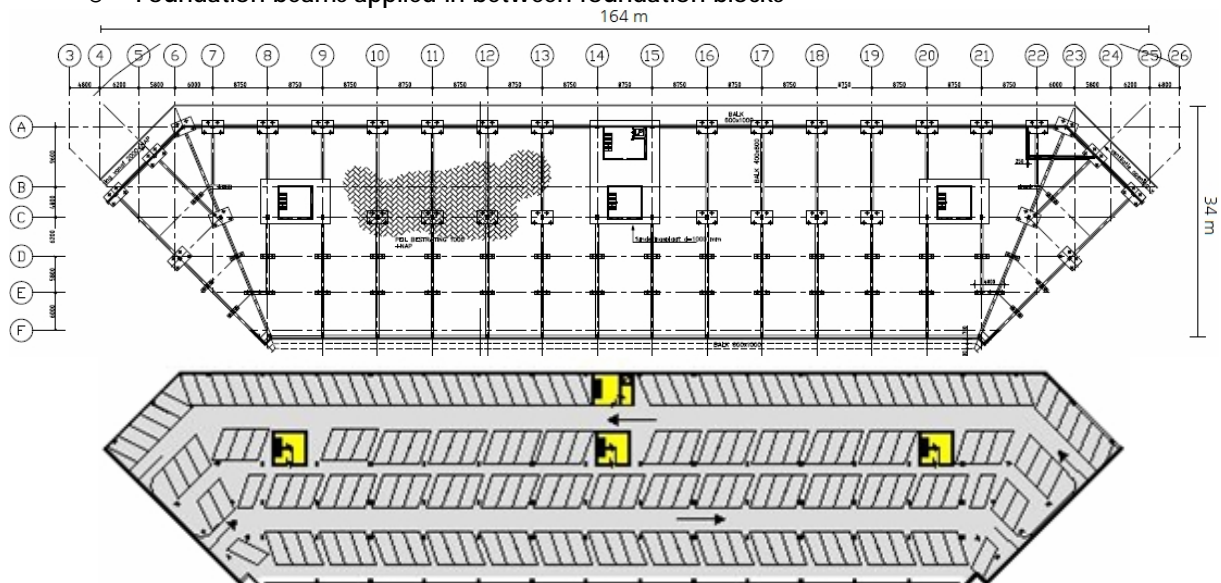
Structural and functional plan for the -2<sup>nd</sup> floor
